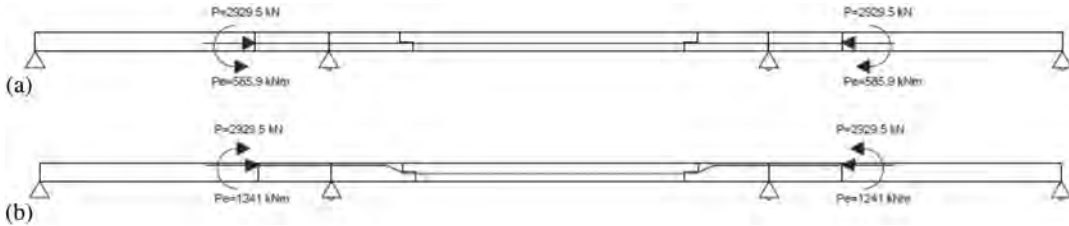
External prestressing introduced in a Niagara-type bridge. (a) Slightly eccentric tendon; (b) eccentrically shaped tendon
